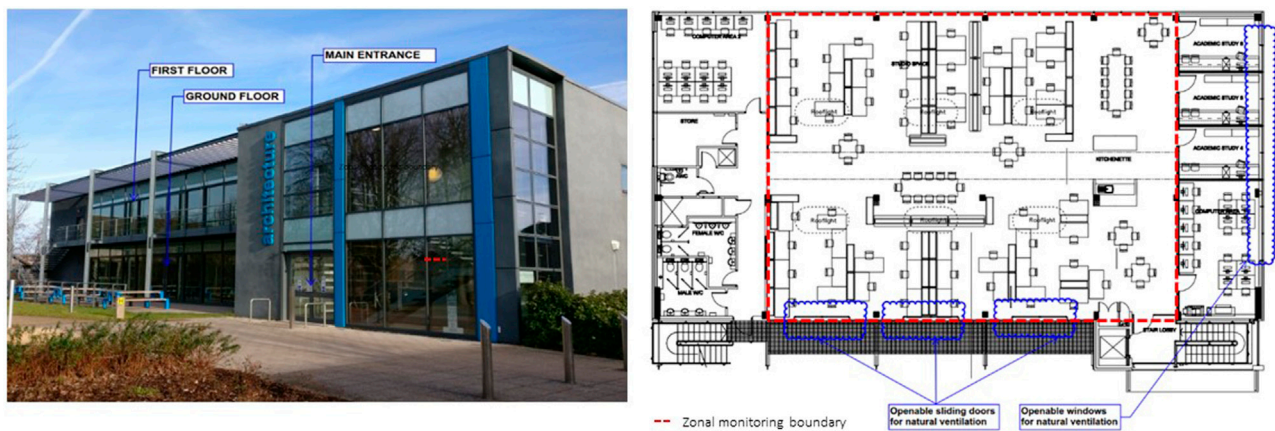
| Keith Green Building, School of Architecture, Loughborough University (left) and First Floor Open Studio space used for the IAQ monitoring campaign (right).
